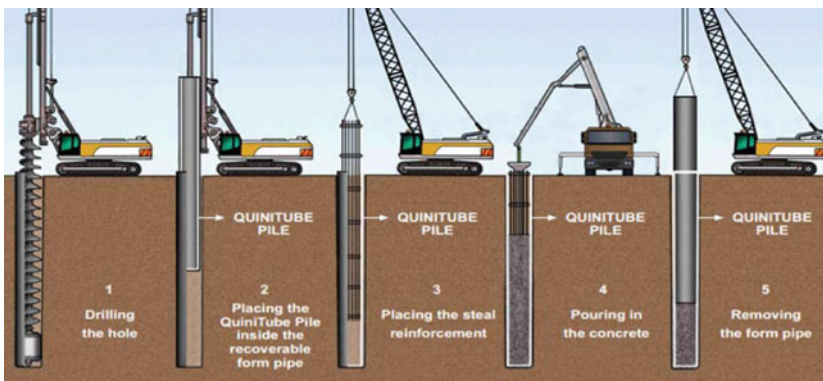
Manufacturing technology of the pile foundation at the construction site
